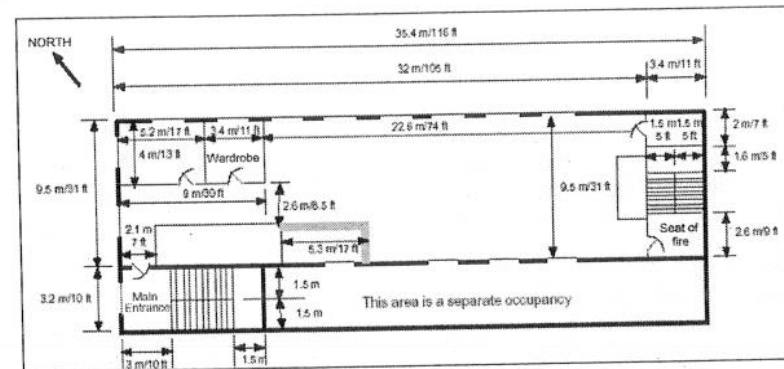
Floor plan of Gothenburg Disco building in which the incident took place¹
